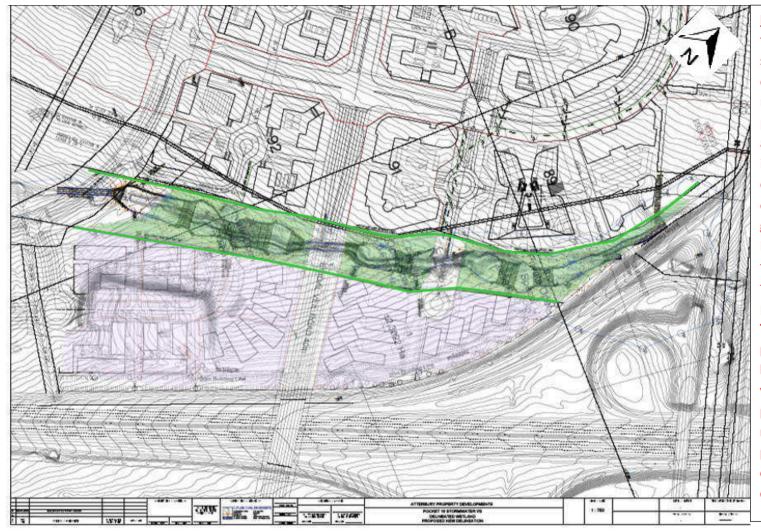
Previously approved layout plan including the rehabilitated wetland area and approved storm water layout.
